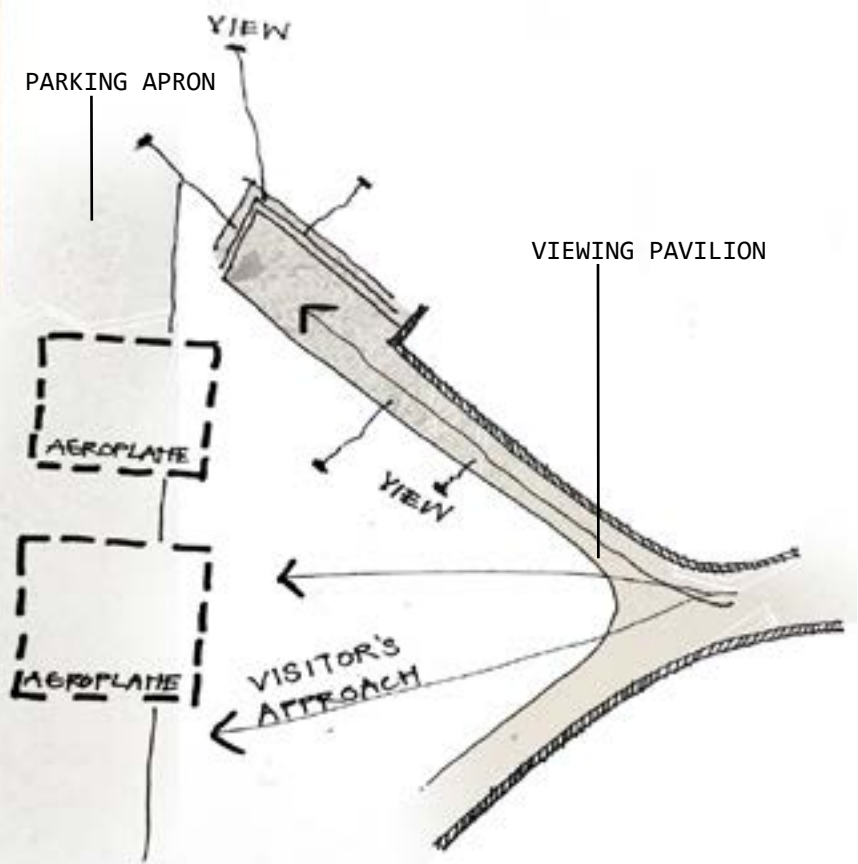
N: Viewing pavilion connection with taxiway/ parking apron (Author, 2021)
